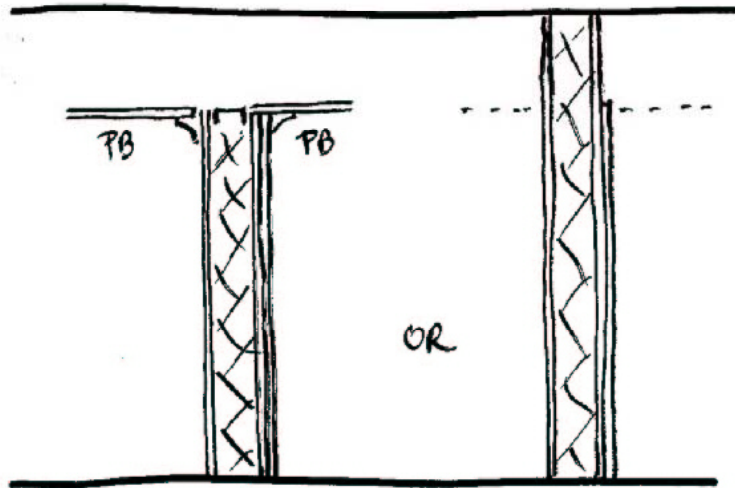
Grade 1 Construction Arrangement - Drywall
